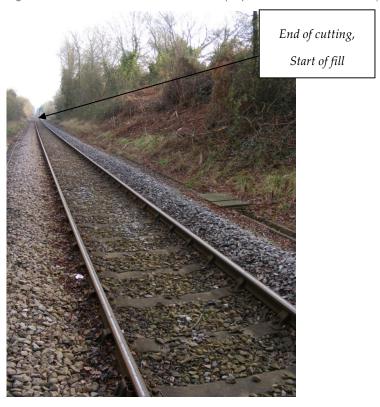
Embankment to southern side of proposed Hounsdown station (looking south-east).
